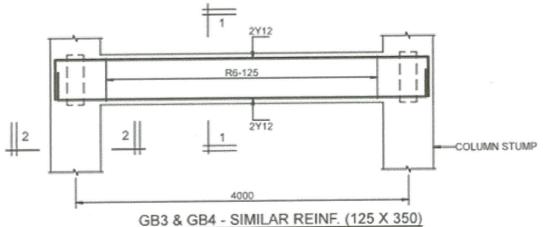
(b): GROUND FLOOR PLAN AND CROSS SECTION GROUND BEAM
